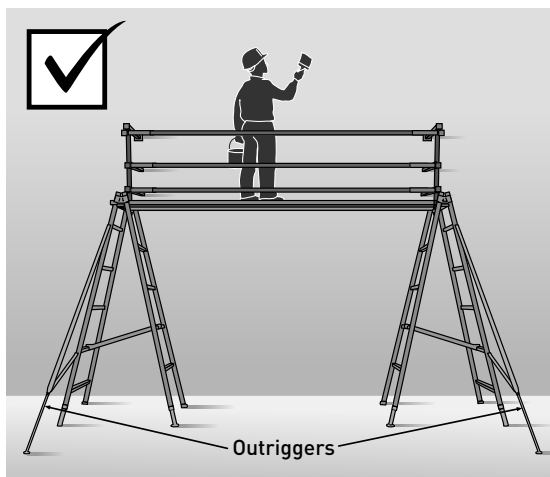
Trestle ladder scaffold with guardrailing and outriggers for stability
